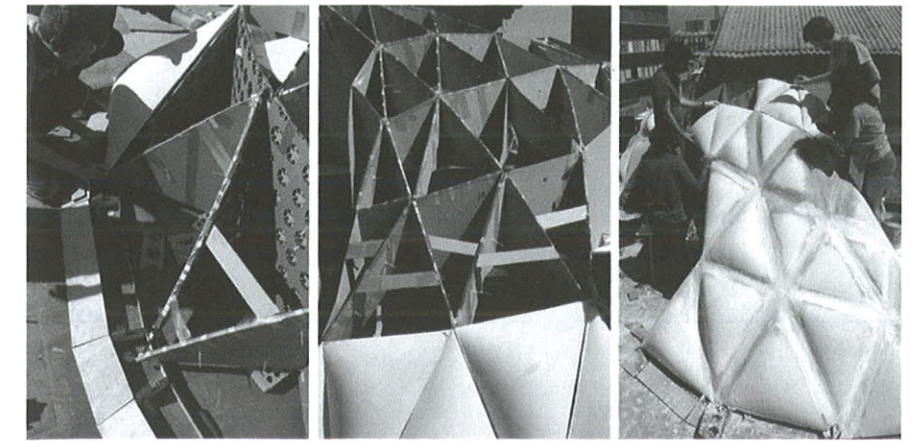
Construction: use of cardboard scaffolding to position and support fabric-formed precast panels prior to joining (Maxwell 2013)
